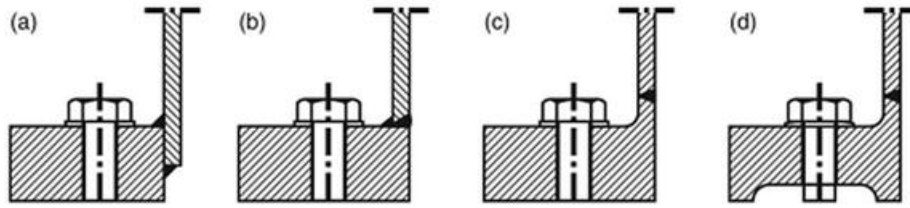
Scheme of different model types of conventional ring-flange connections: (a) slip-on flange, (b) welding on flange, (c) welding-neck flange and (d) welding-neck flange with defined contact area [45].
